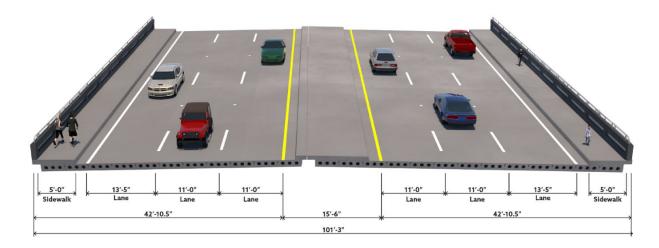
Western Pair Existing Bridge Configuration (Bridge ID 870083 and 870549)
